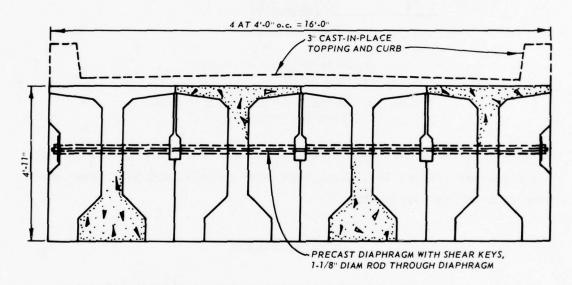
Cross section of the Klickitat River bridge girders (from Reference 28)
